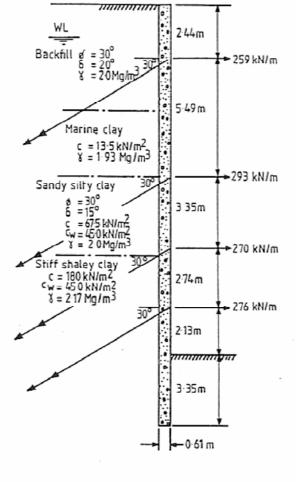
Anchored diaphragm wall for CPF building, Singapore (from Hanna, 1982)
